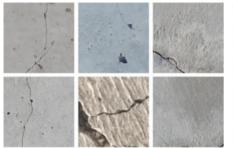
Graphical Examples of Cracks on Figure 2 Graphical Examples of Non-Concrete Structures
